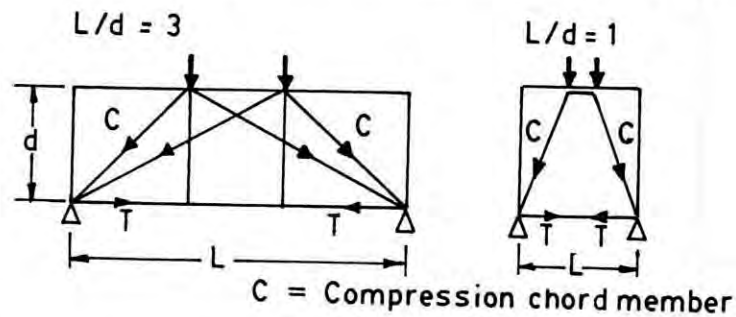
Truss analogy for the cracked state of deep beam(13)
